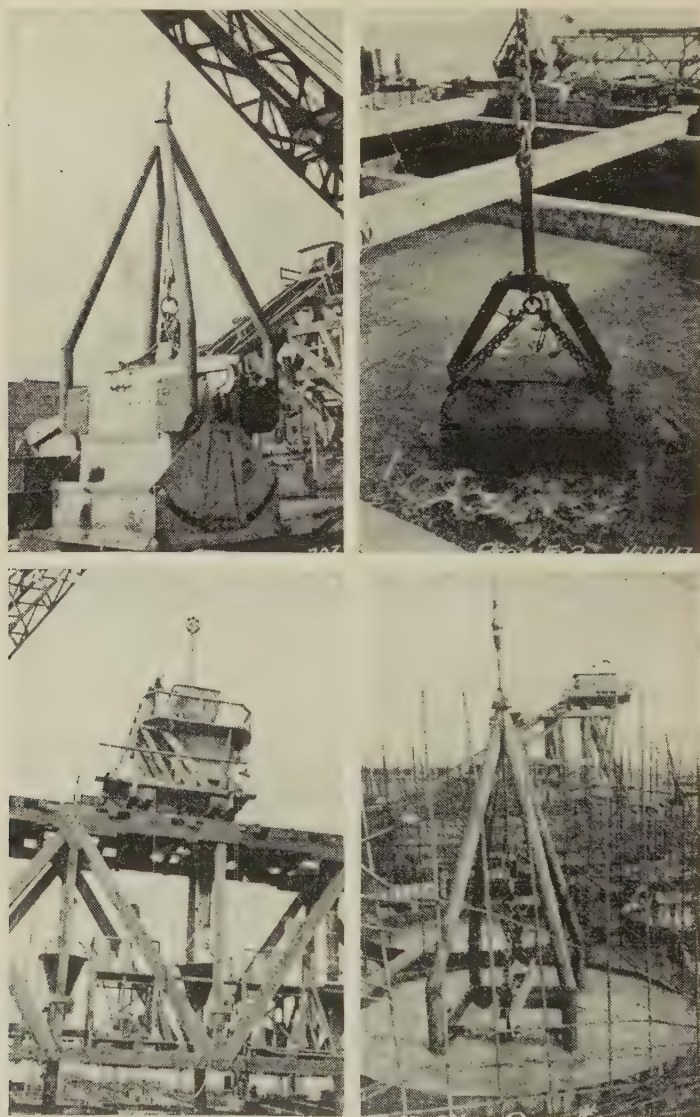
CONSTRUCTION OPERATIONS S. F. O. B. BRIDGE
